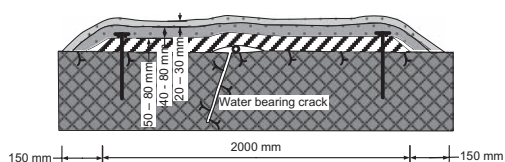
The Swedish drain consists of a perforated plastic tube at the water bearing crack, which is covered by an insulating sheet with closed pores. The sheet is fixed to the rock by short bolts and reinforcement bars. The sheet is covered with steel fibre reinforced shotcrete which bonds to the rock surface at the edges. Finally the steel fibre reinforced shotcrete is covered by unreinforced shotcrete.
